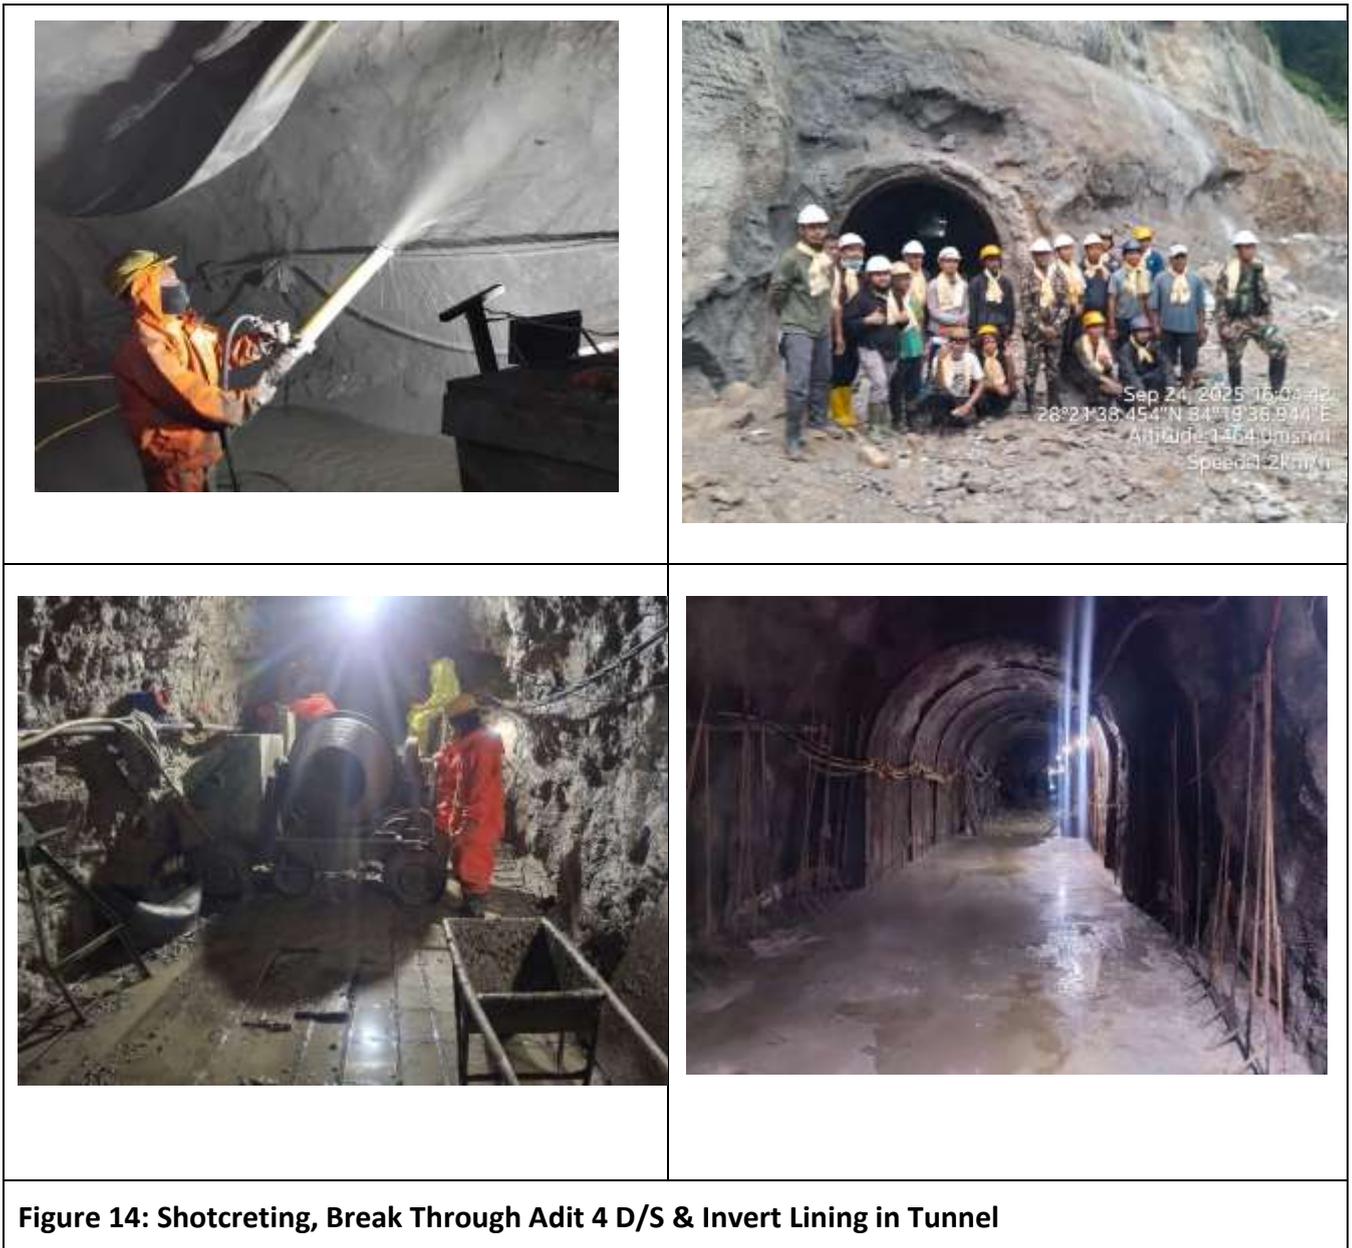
Shotcreting, Break Through Adit 4 D/S & Invert Lining in Tunnel
